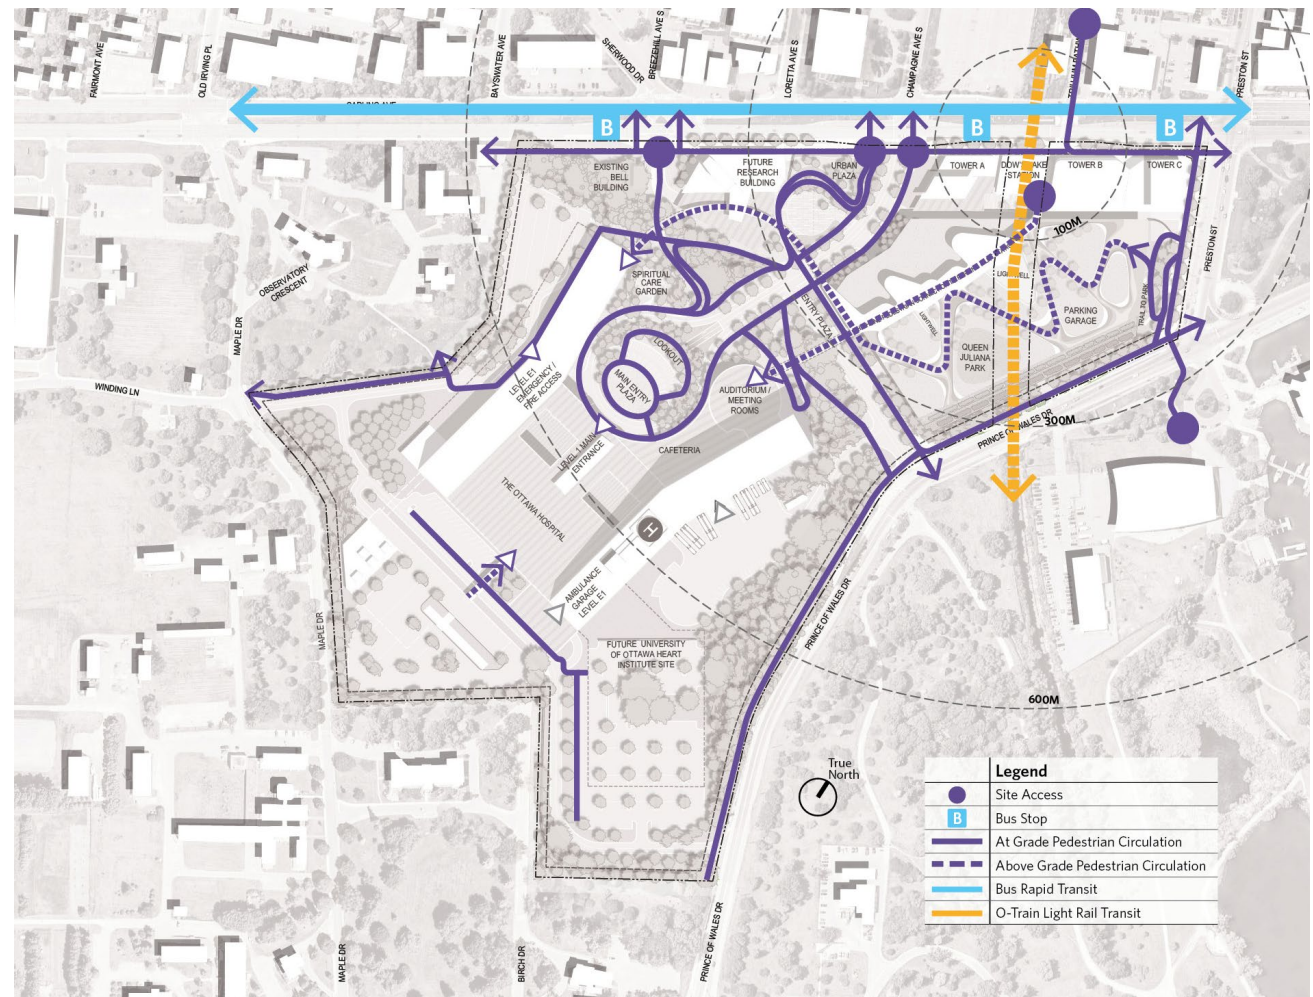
Master Site Plan - Transit and Pedestrian Circulation
